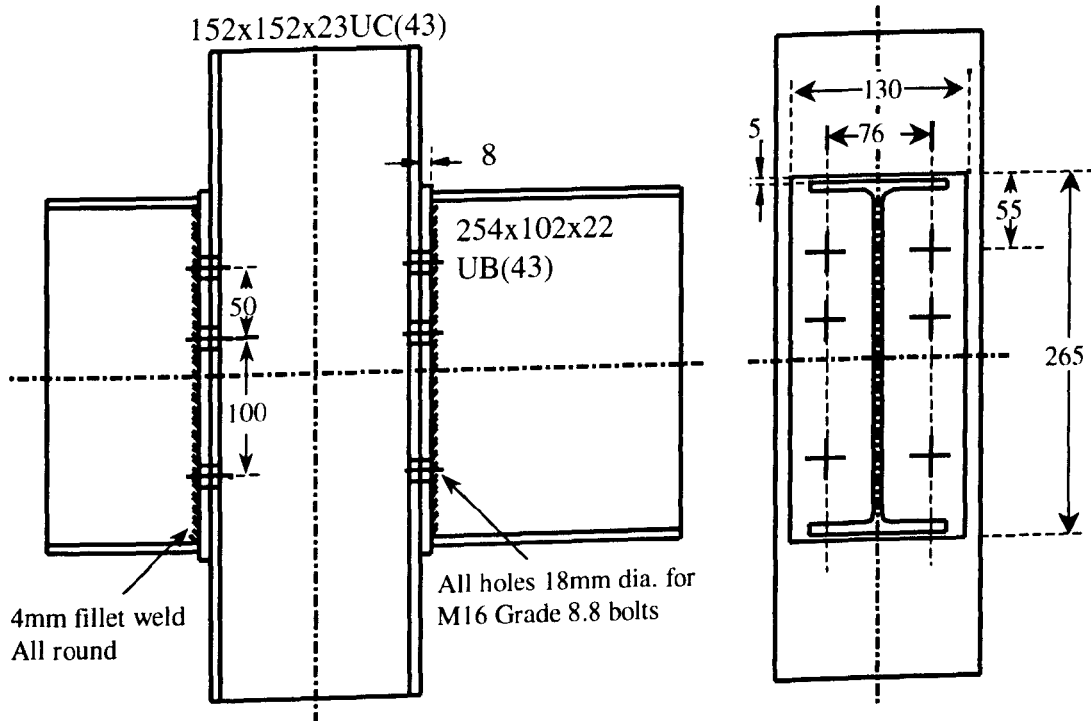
Bare steel flush end plate joint detail^{6.3,6.4}
